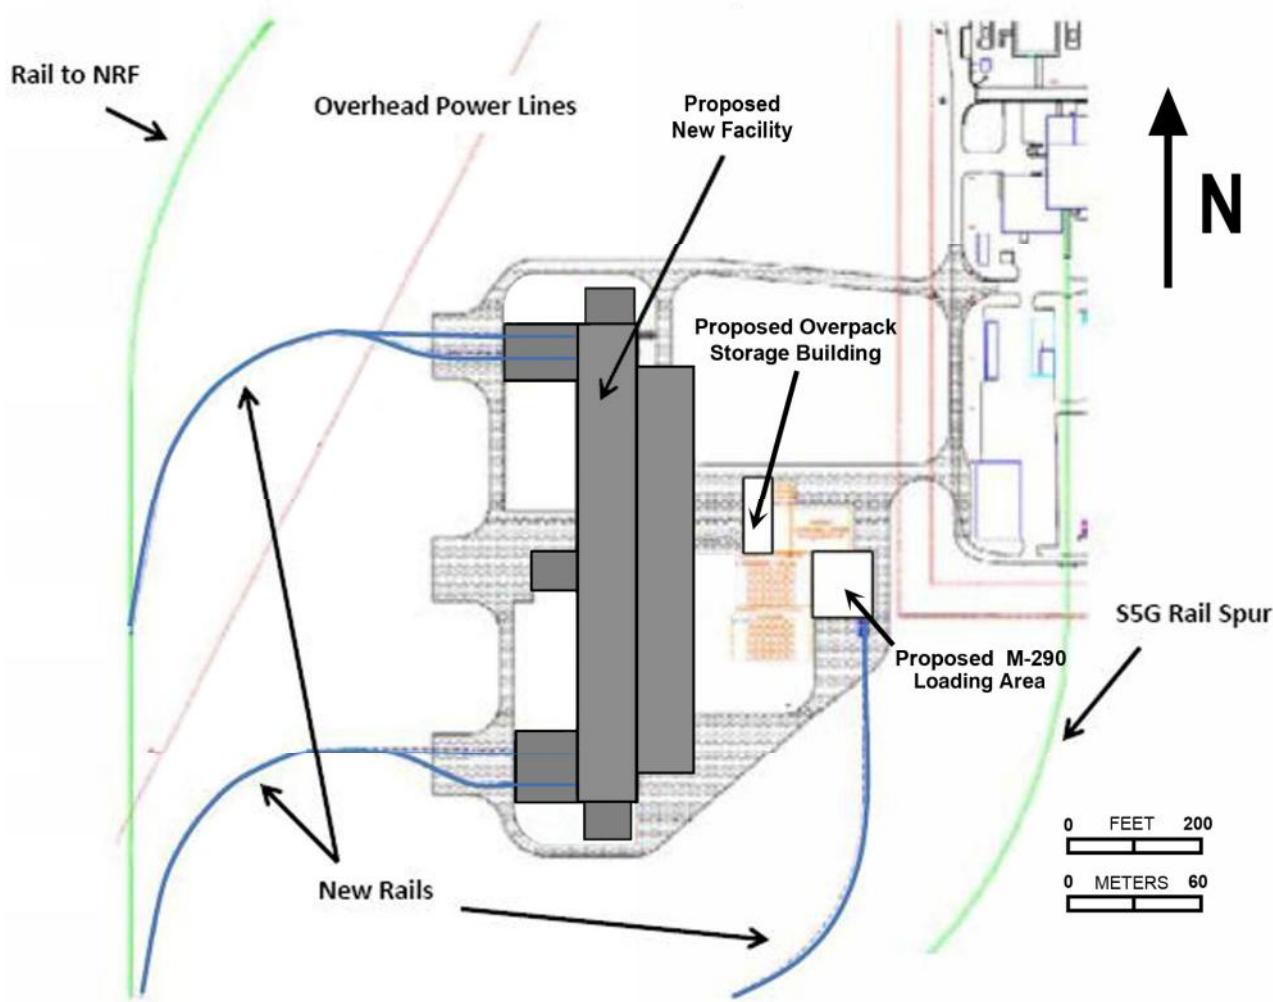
Conceptual New Facility Layout at Location 6
